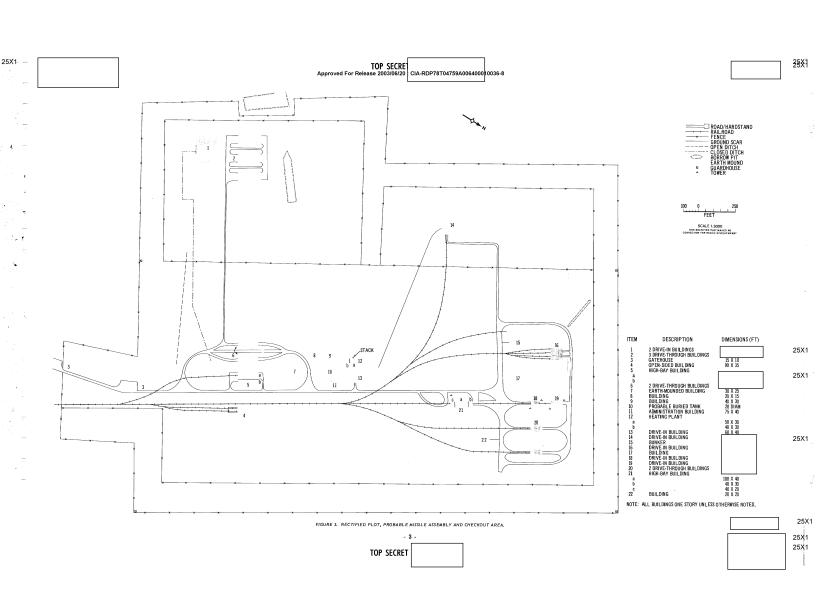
PROBABLE MISSILE ASSEMBLY AND CHECKOUT AREA, KY/VLAD MT L.
